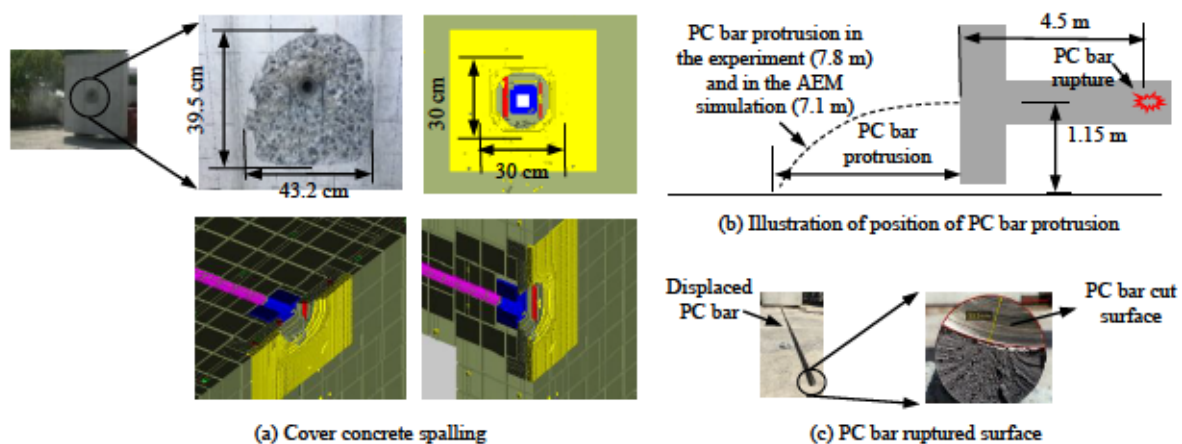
Cover concrete spalling, illustration of PC bar protrusion and PC bar ruptured surface [1]
